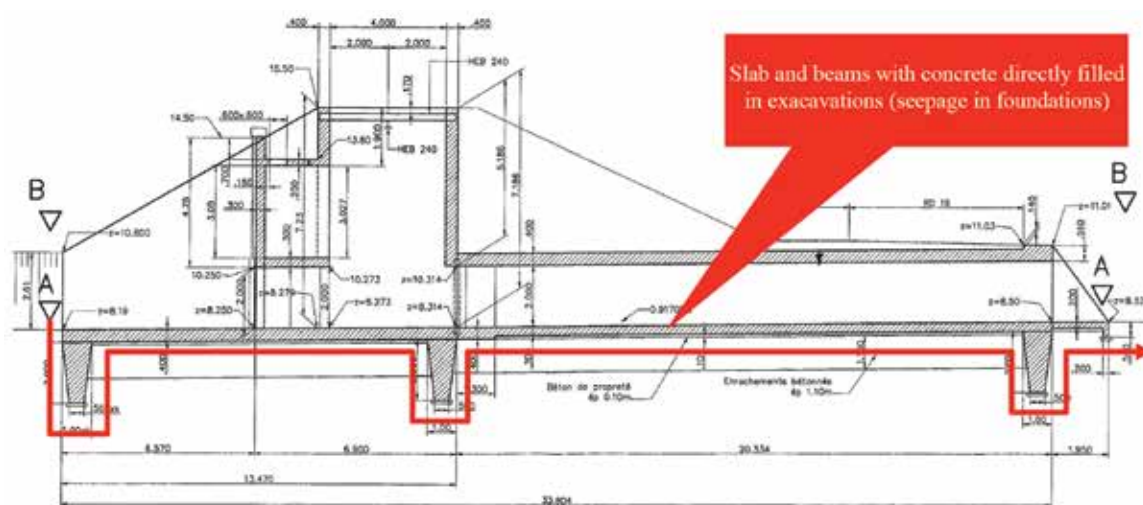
Cross-section through hydraulic crossing structure at Aramon (courtesy Thibaut Mallet)
